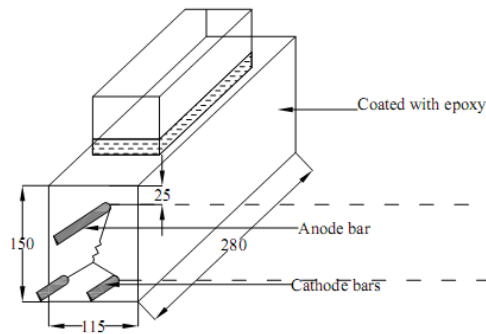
Details of ASTM G 109 test specimen with dam on the top surface
